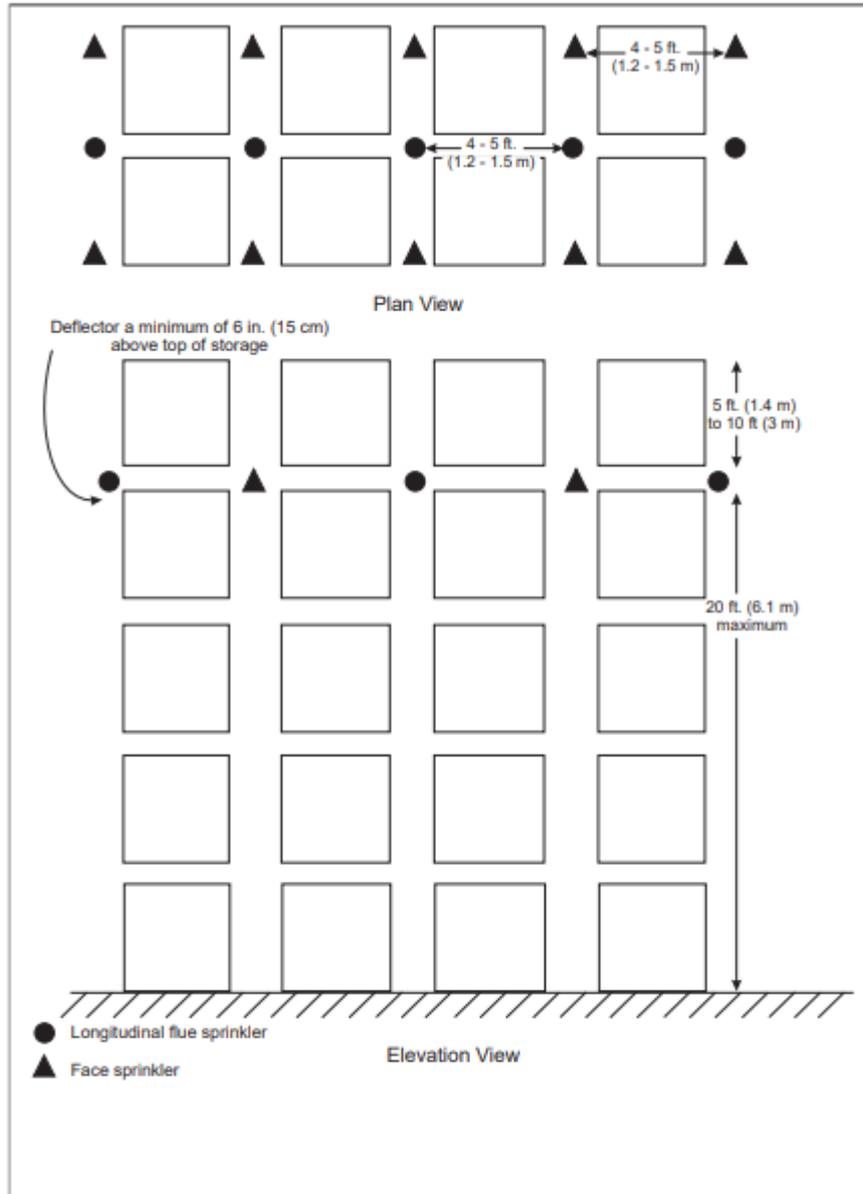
Double row rack sprinkler layout - fire protection scheme E
